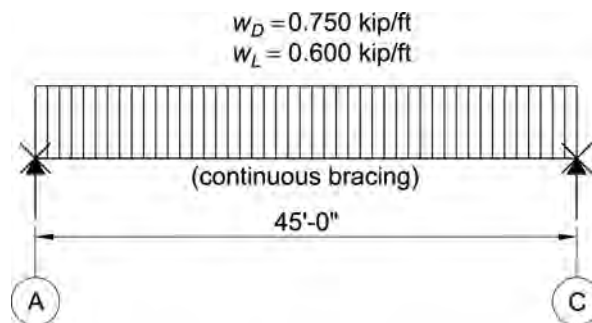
Loading and bracing diagram for typical interior composite floor beams.
